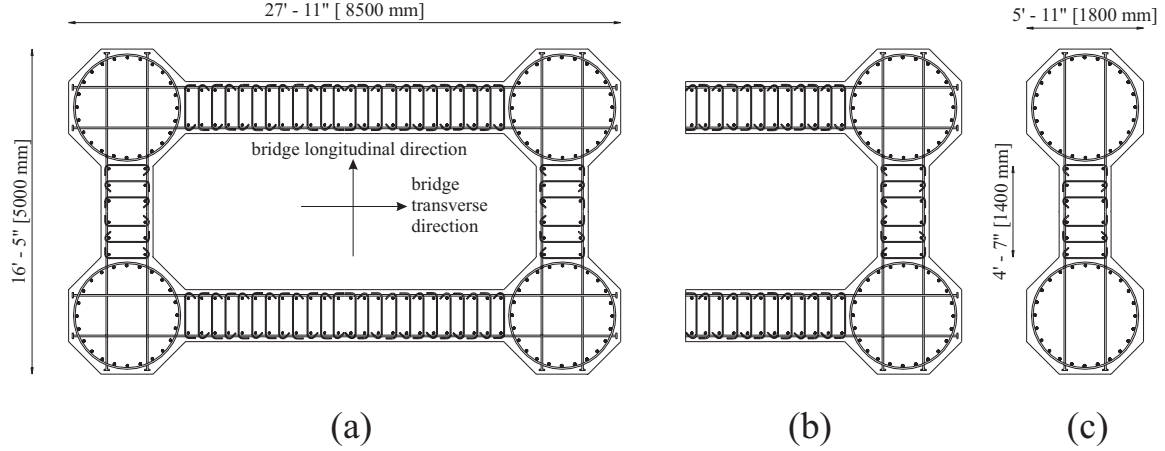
(a) Early proposal for a typical cross section of the 2nd Benicia Martinez Bridge Piers. (b) True half section with tributary longitudinal reinforcement in the wall. (c) Test subassembly consisting of a single structural wall with boundary elements.
